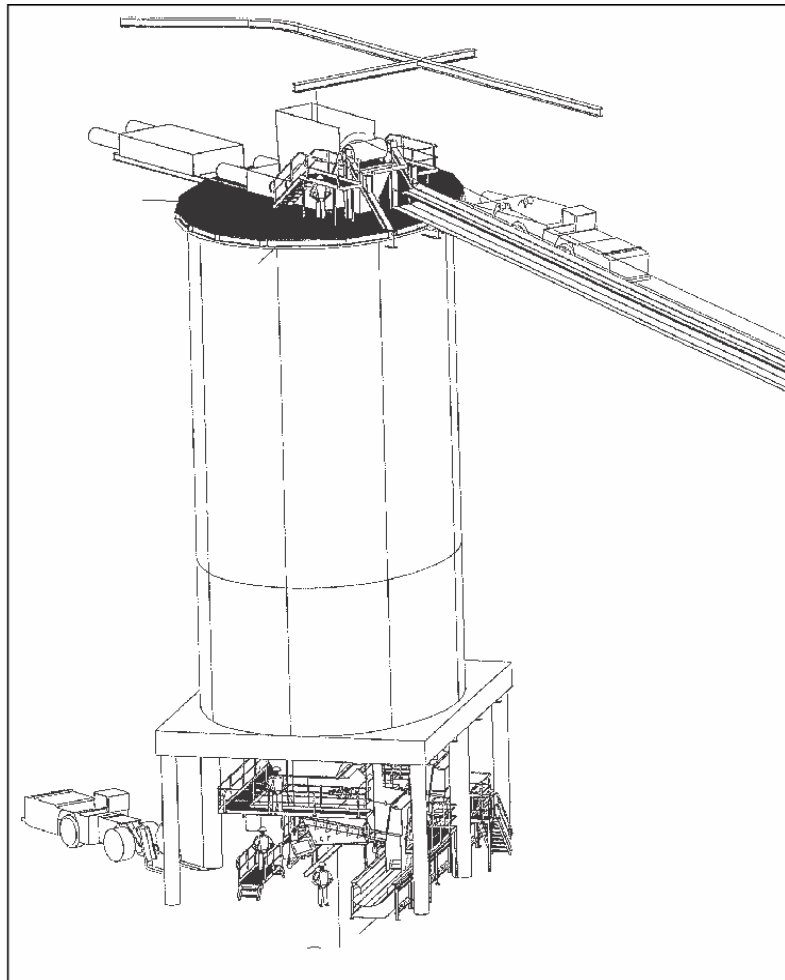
3D diagram of underground coal storage bin arrangement. (Courtesy of Arkhill Engineers.)
